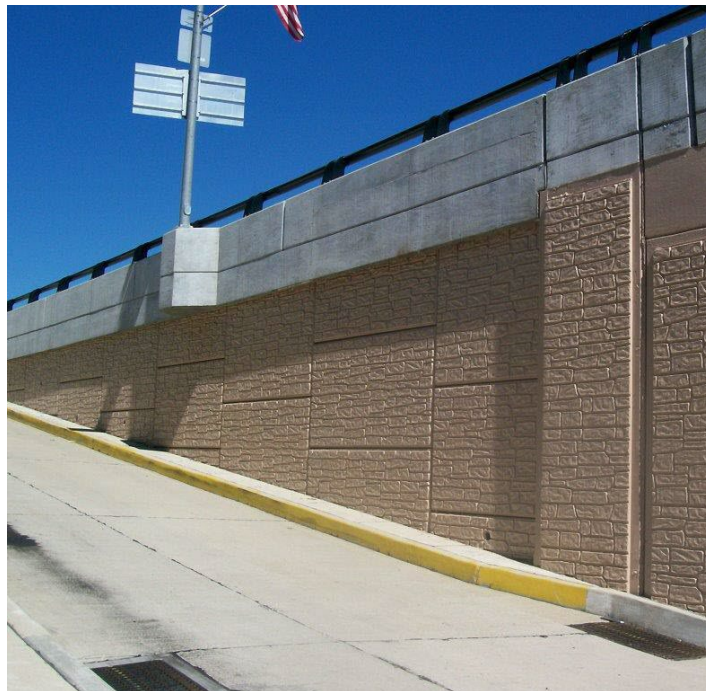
Anti-Graffiti Coating on Wingwall
